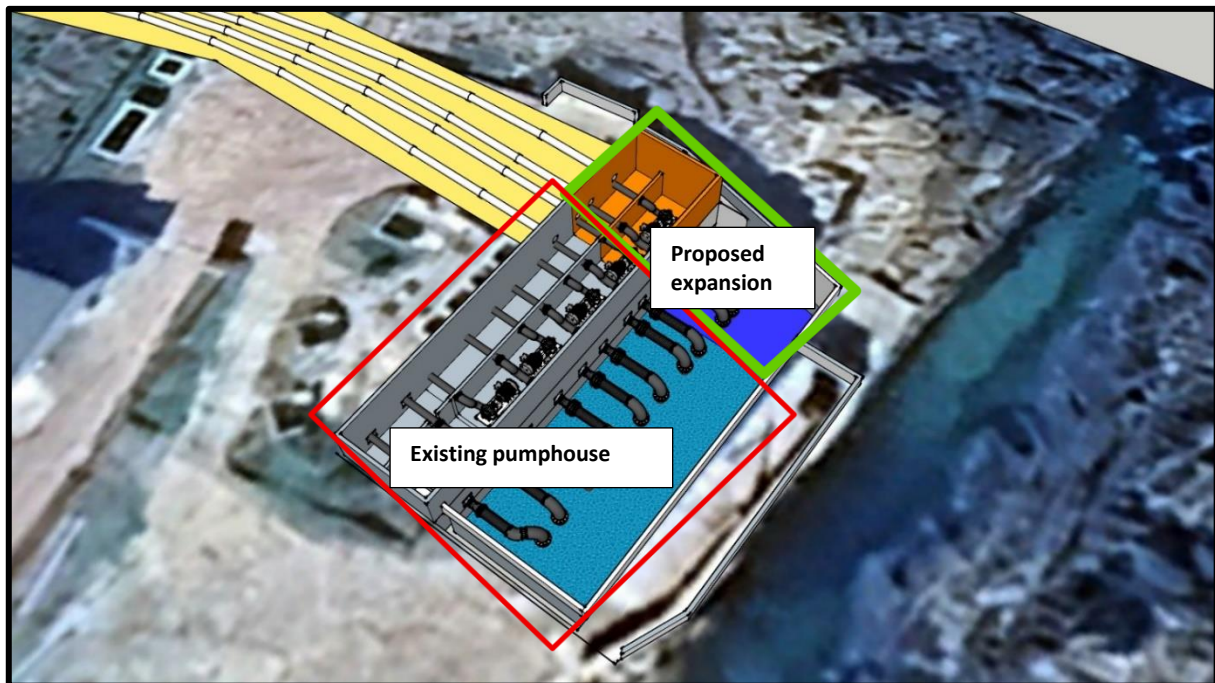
3D view of the existing pumphouse and the proposed expansion area.
